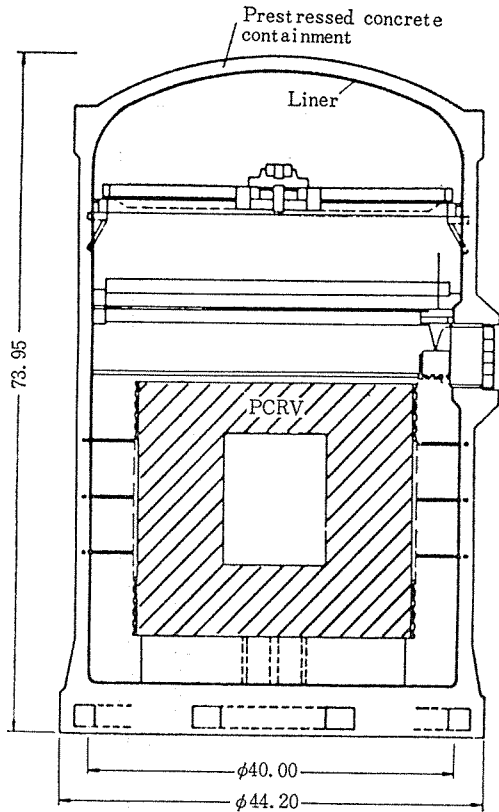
HTR Schmehausen 300 MW. Prestressed Concrete Containment and PCRV
